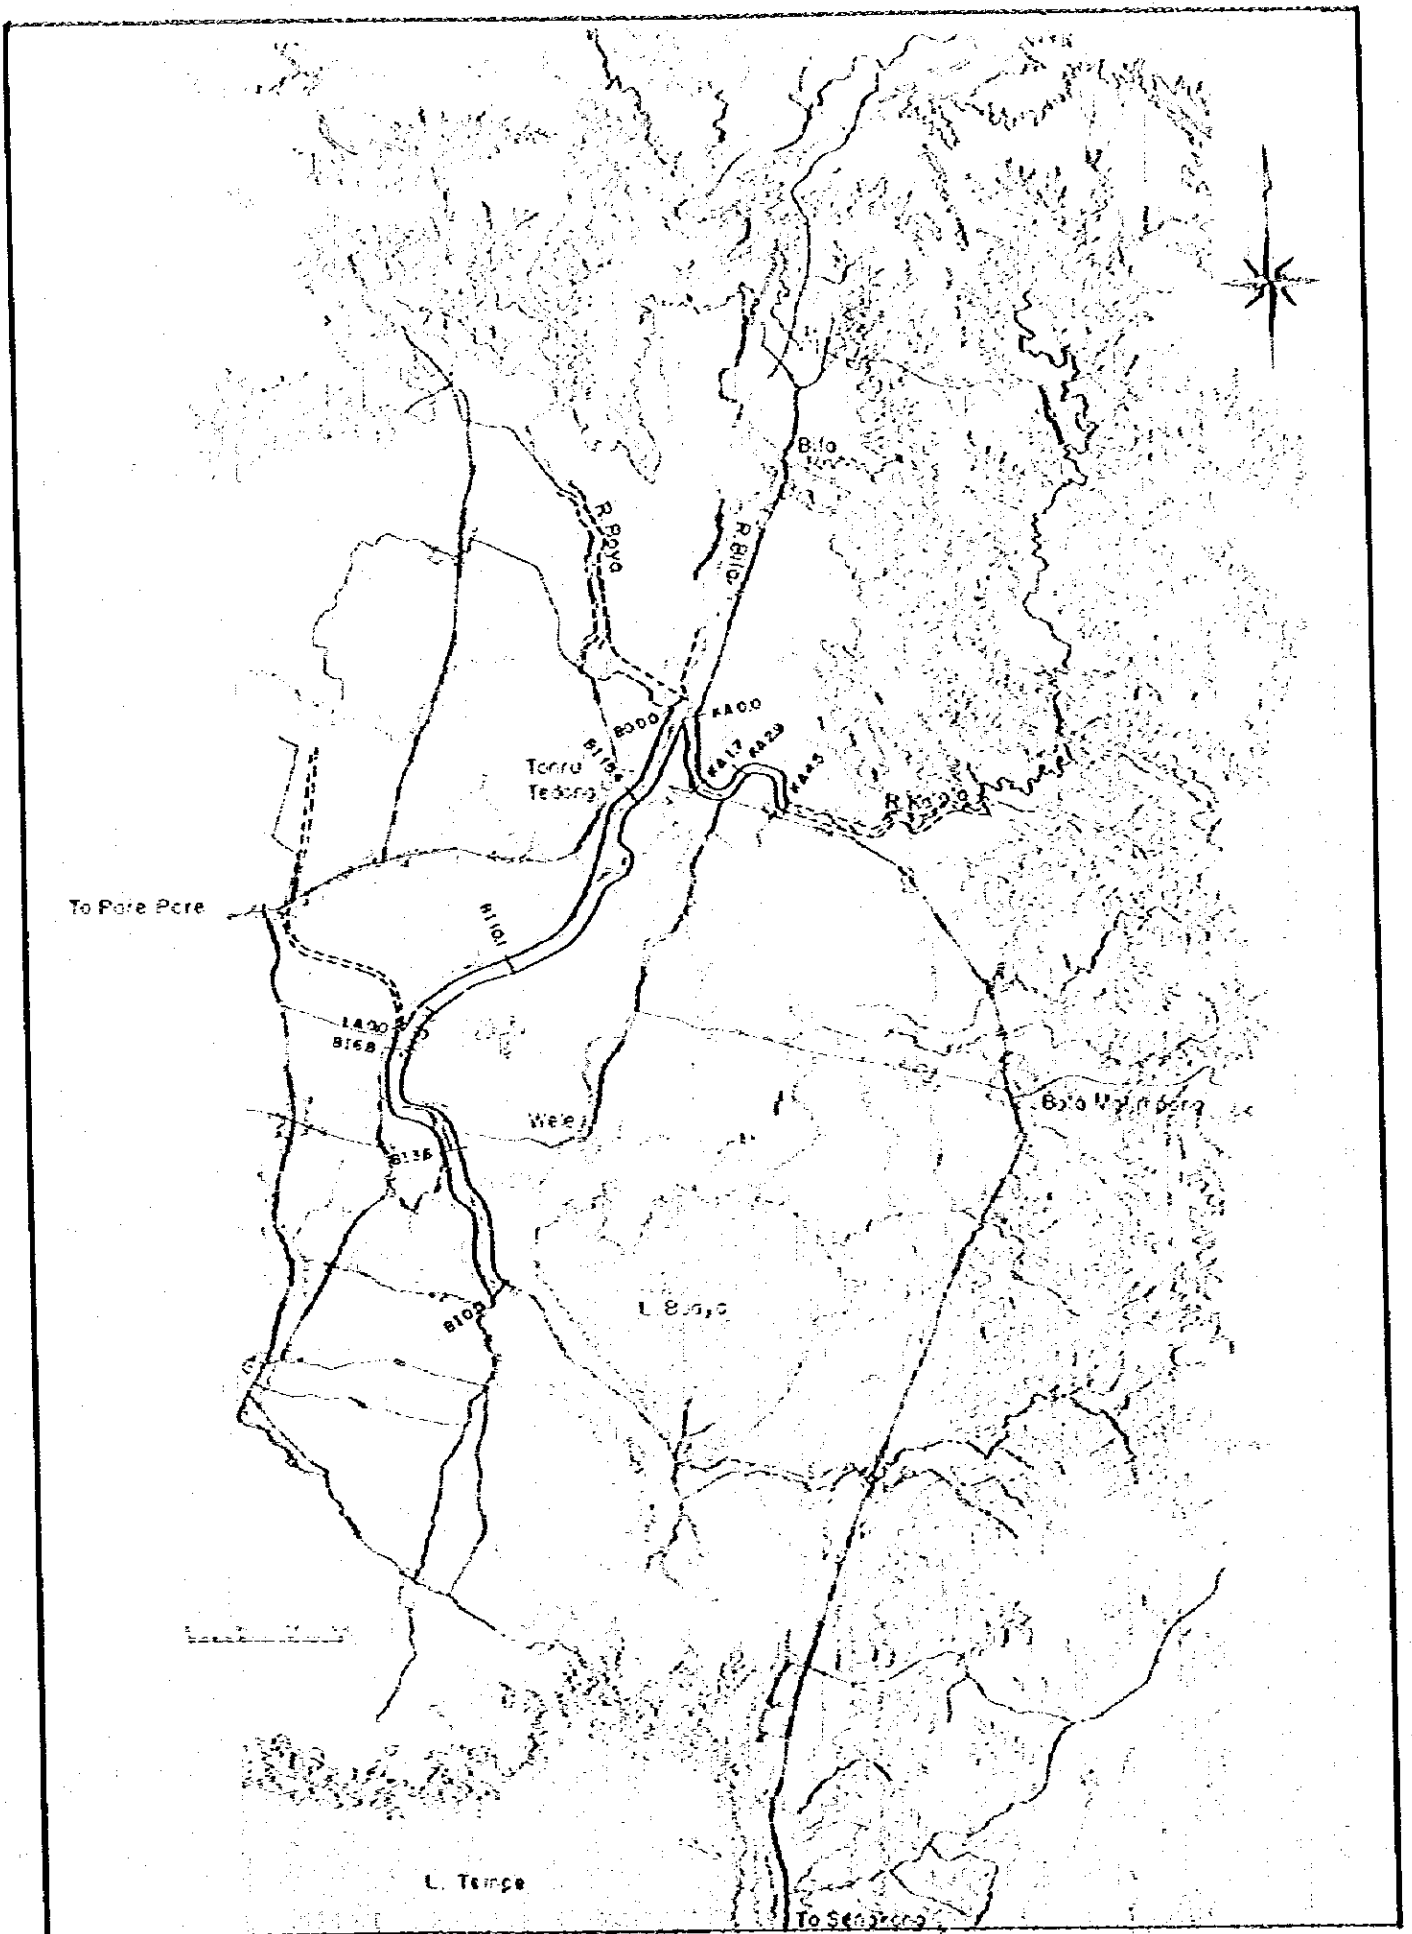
PLAN 1 (IMPROVEMENT OF THE EXISTING RIVER CHANNEL)
